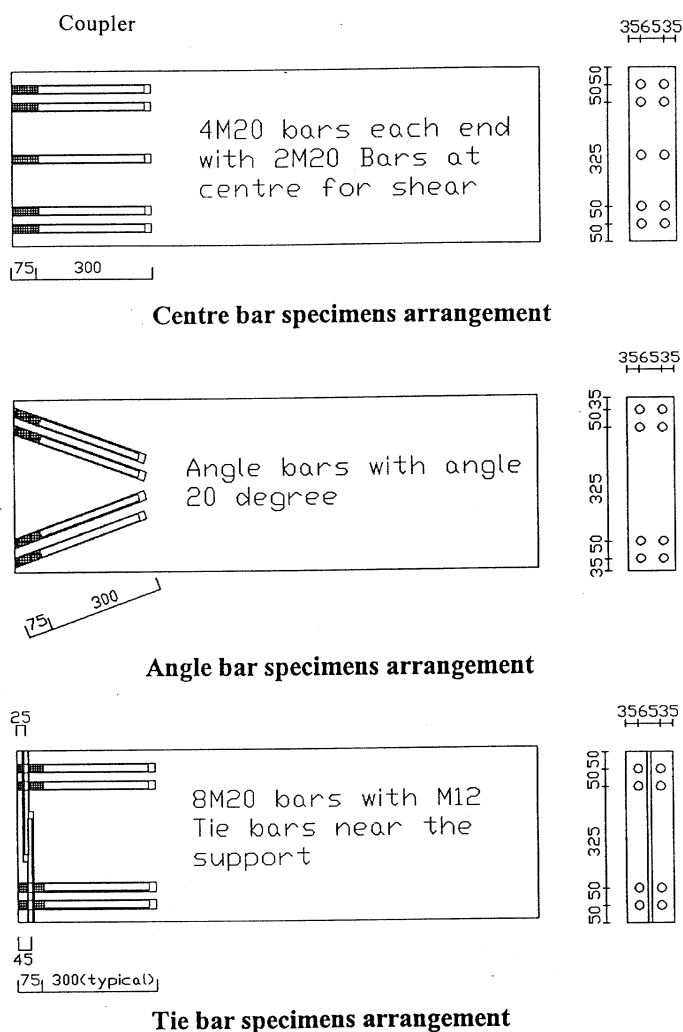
Epoxy bonded threaded bar arrangements used for the test specimens
